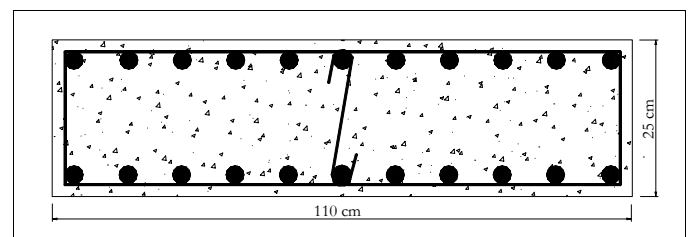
Case 2: Arrangement of reinforcement in cross section of column P1.
